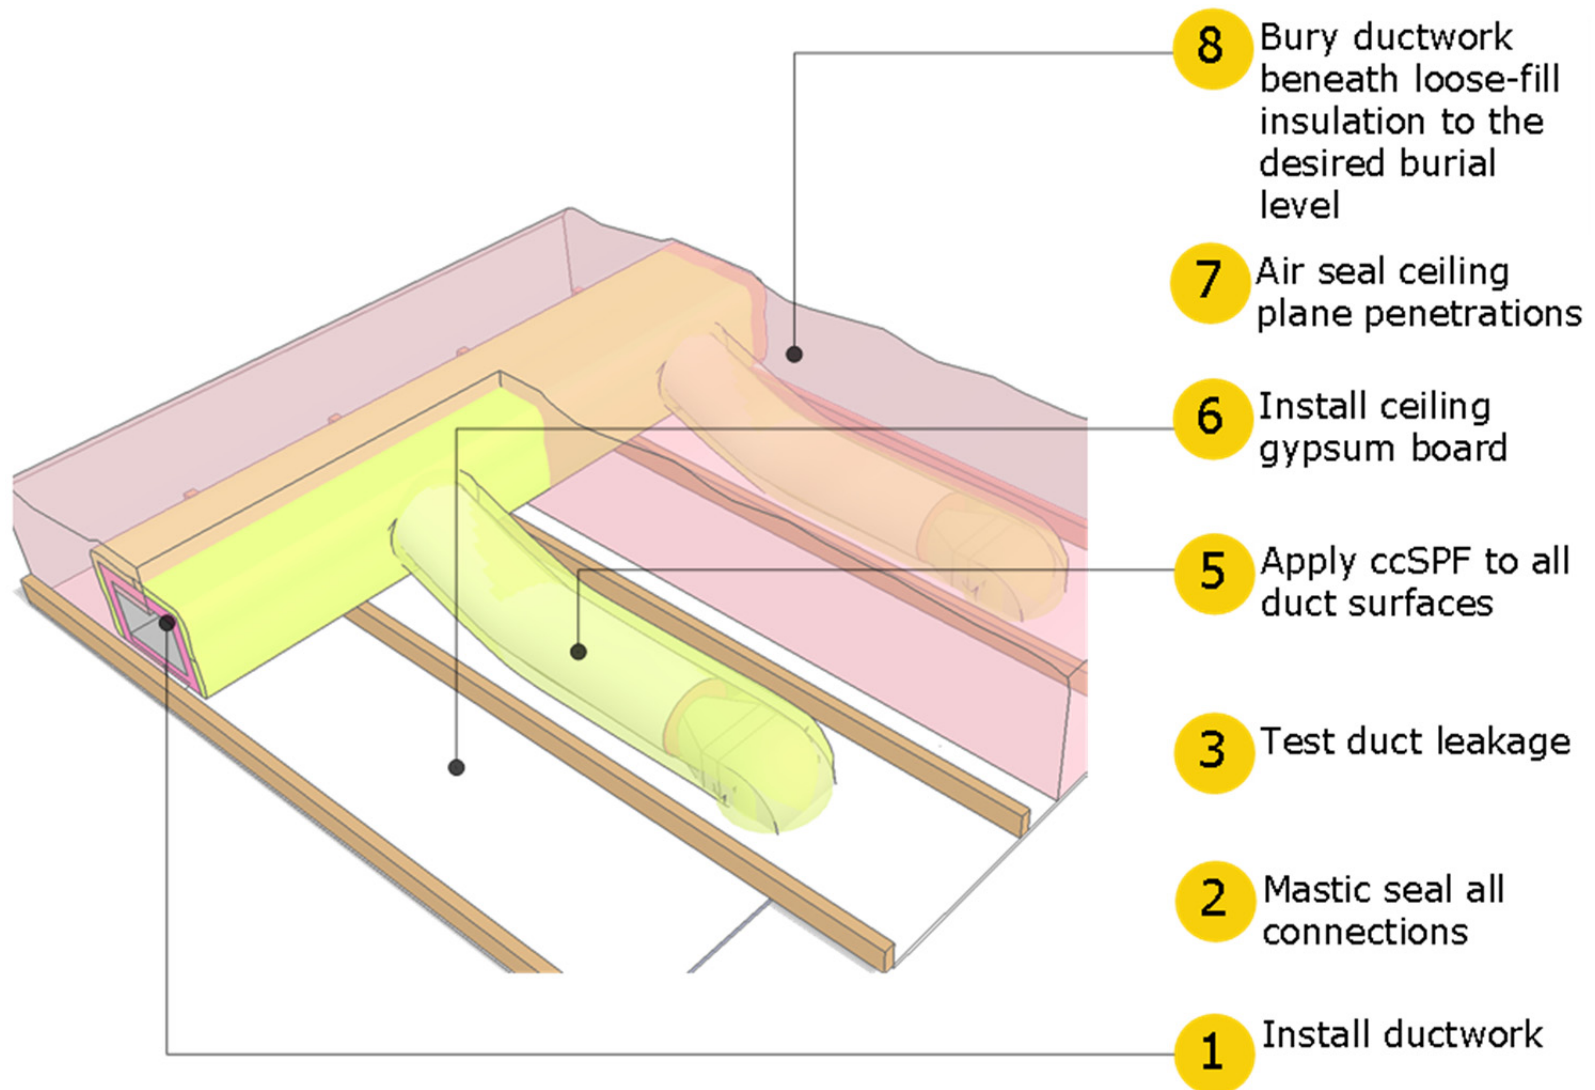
Step-by-step procedure diagram for buried and encapsulated ducts installed before ceiling in new construction
